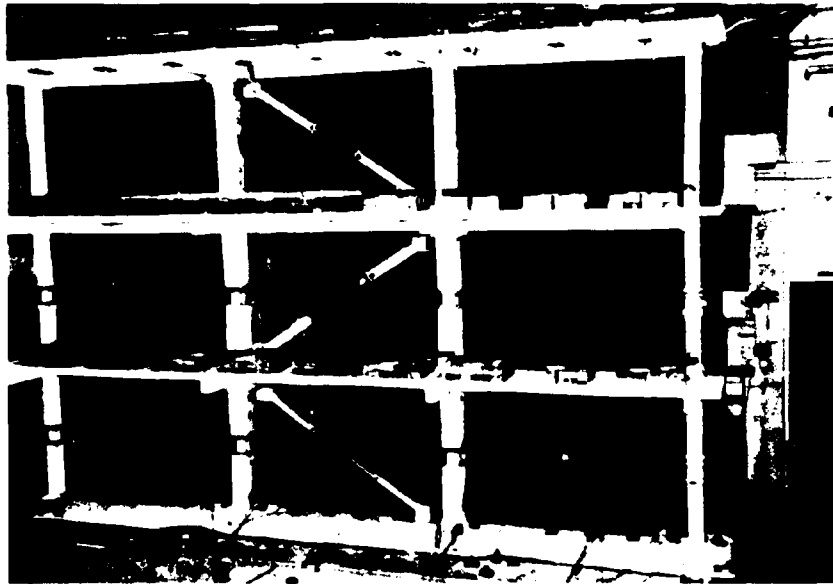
Perspective View of the Frame with Installed Damping Devices
